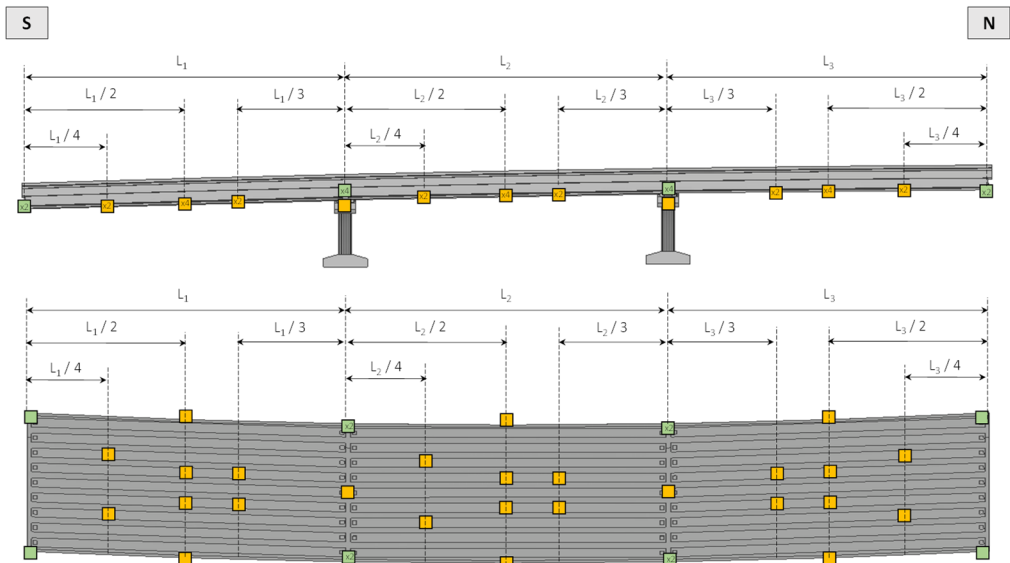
Scheme of fixed equipment installation on the Spyckstraße Bridge. Elevation and underside views
